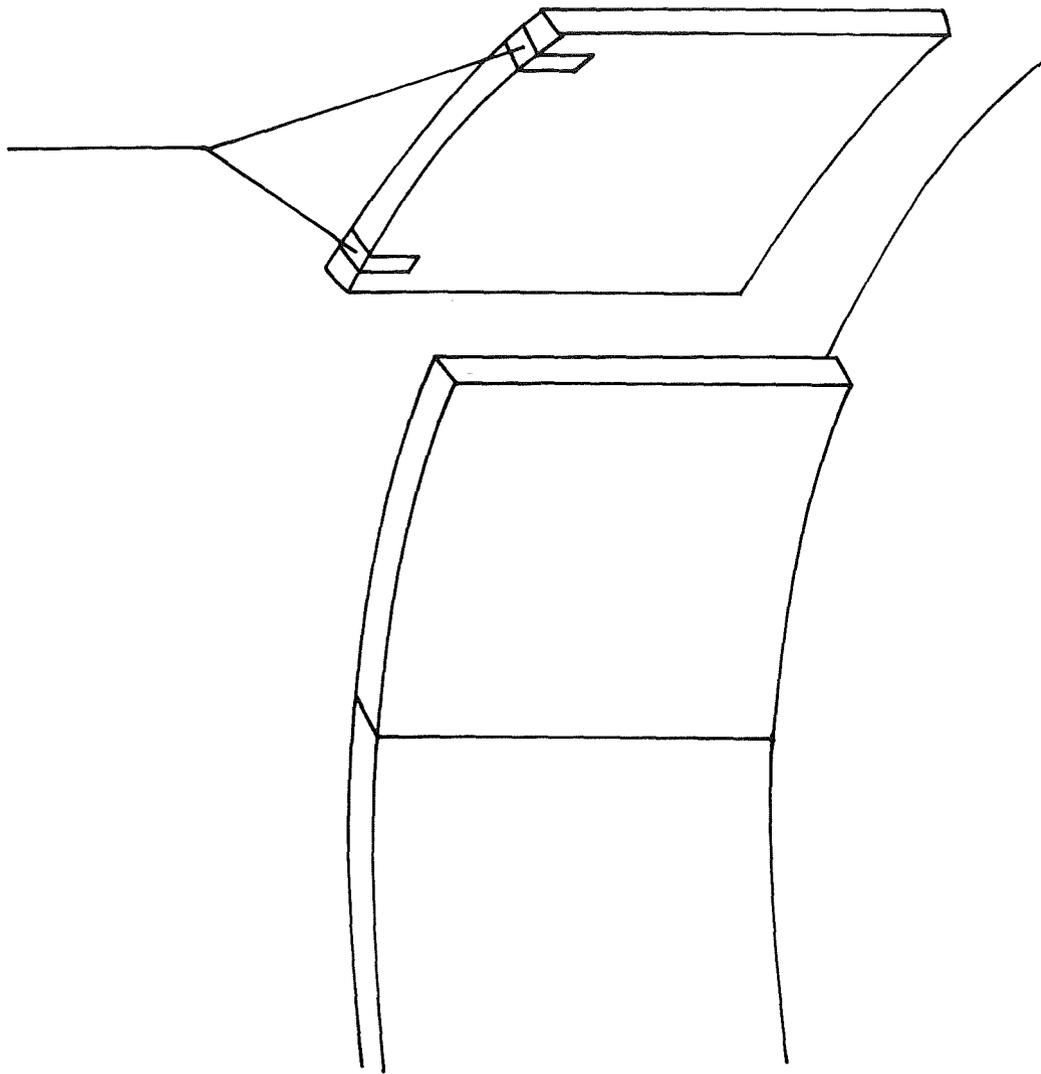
Positioning of Cast Basalt Building Slabs
